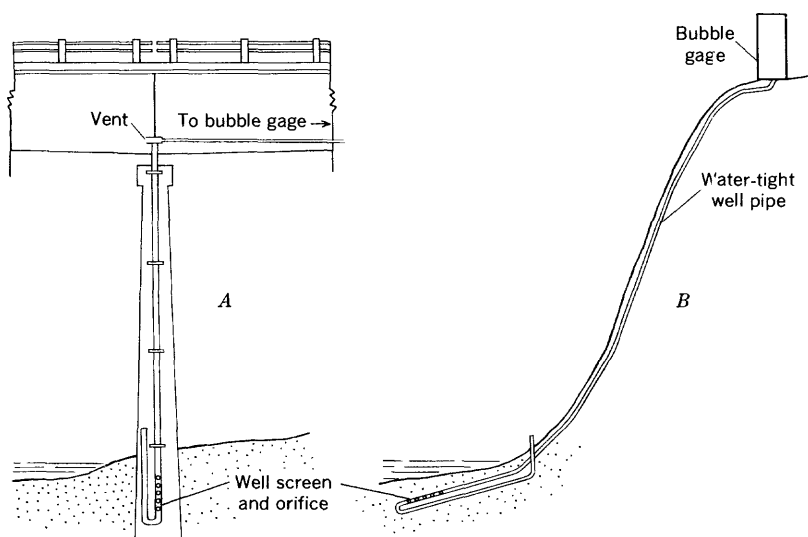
Typical installations of an enclosed orifice bubble-gage system.
